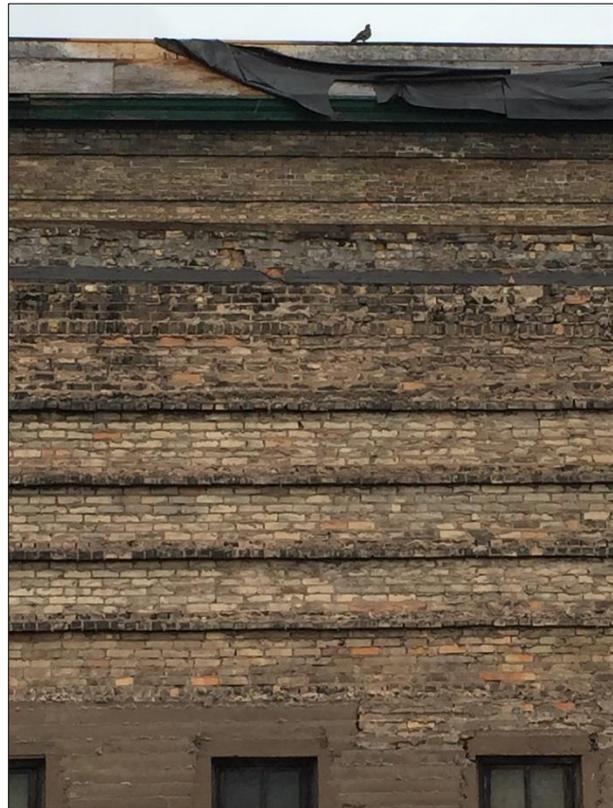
Side of Paul Robeson Ballroom, Damaged brick, brick needs to be tuck-pointed, parapet needs to be repaired
